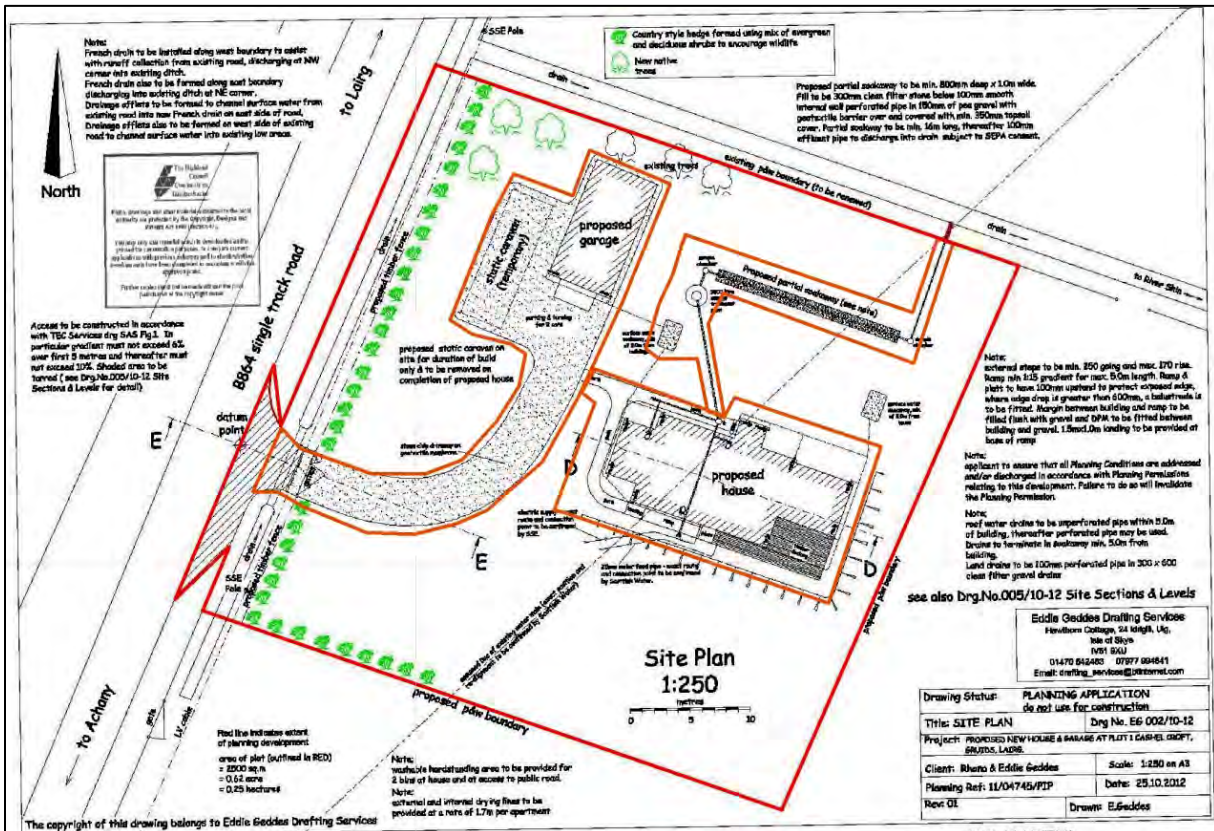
Proposed development footprint with area proposed to be stripped outlined in orange (indicative)
